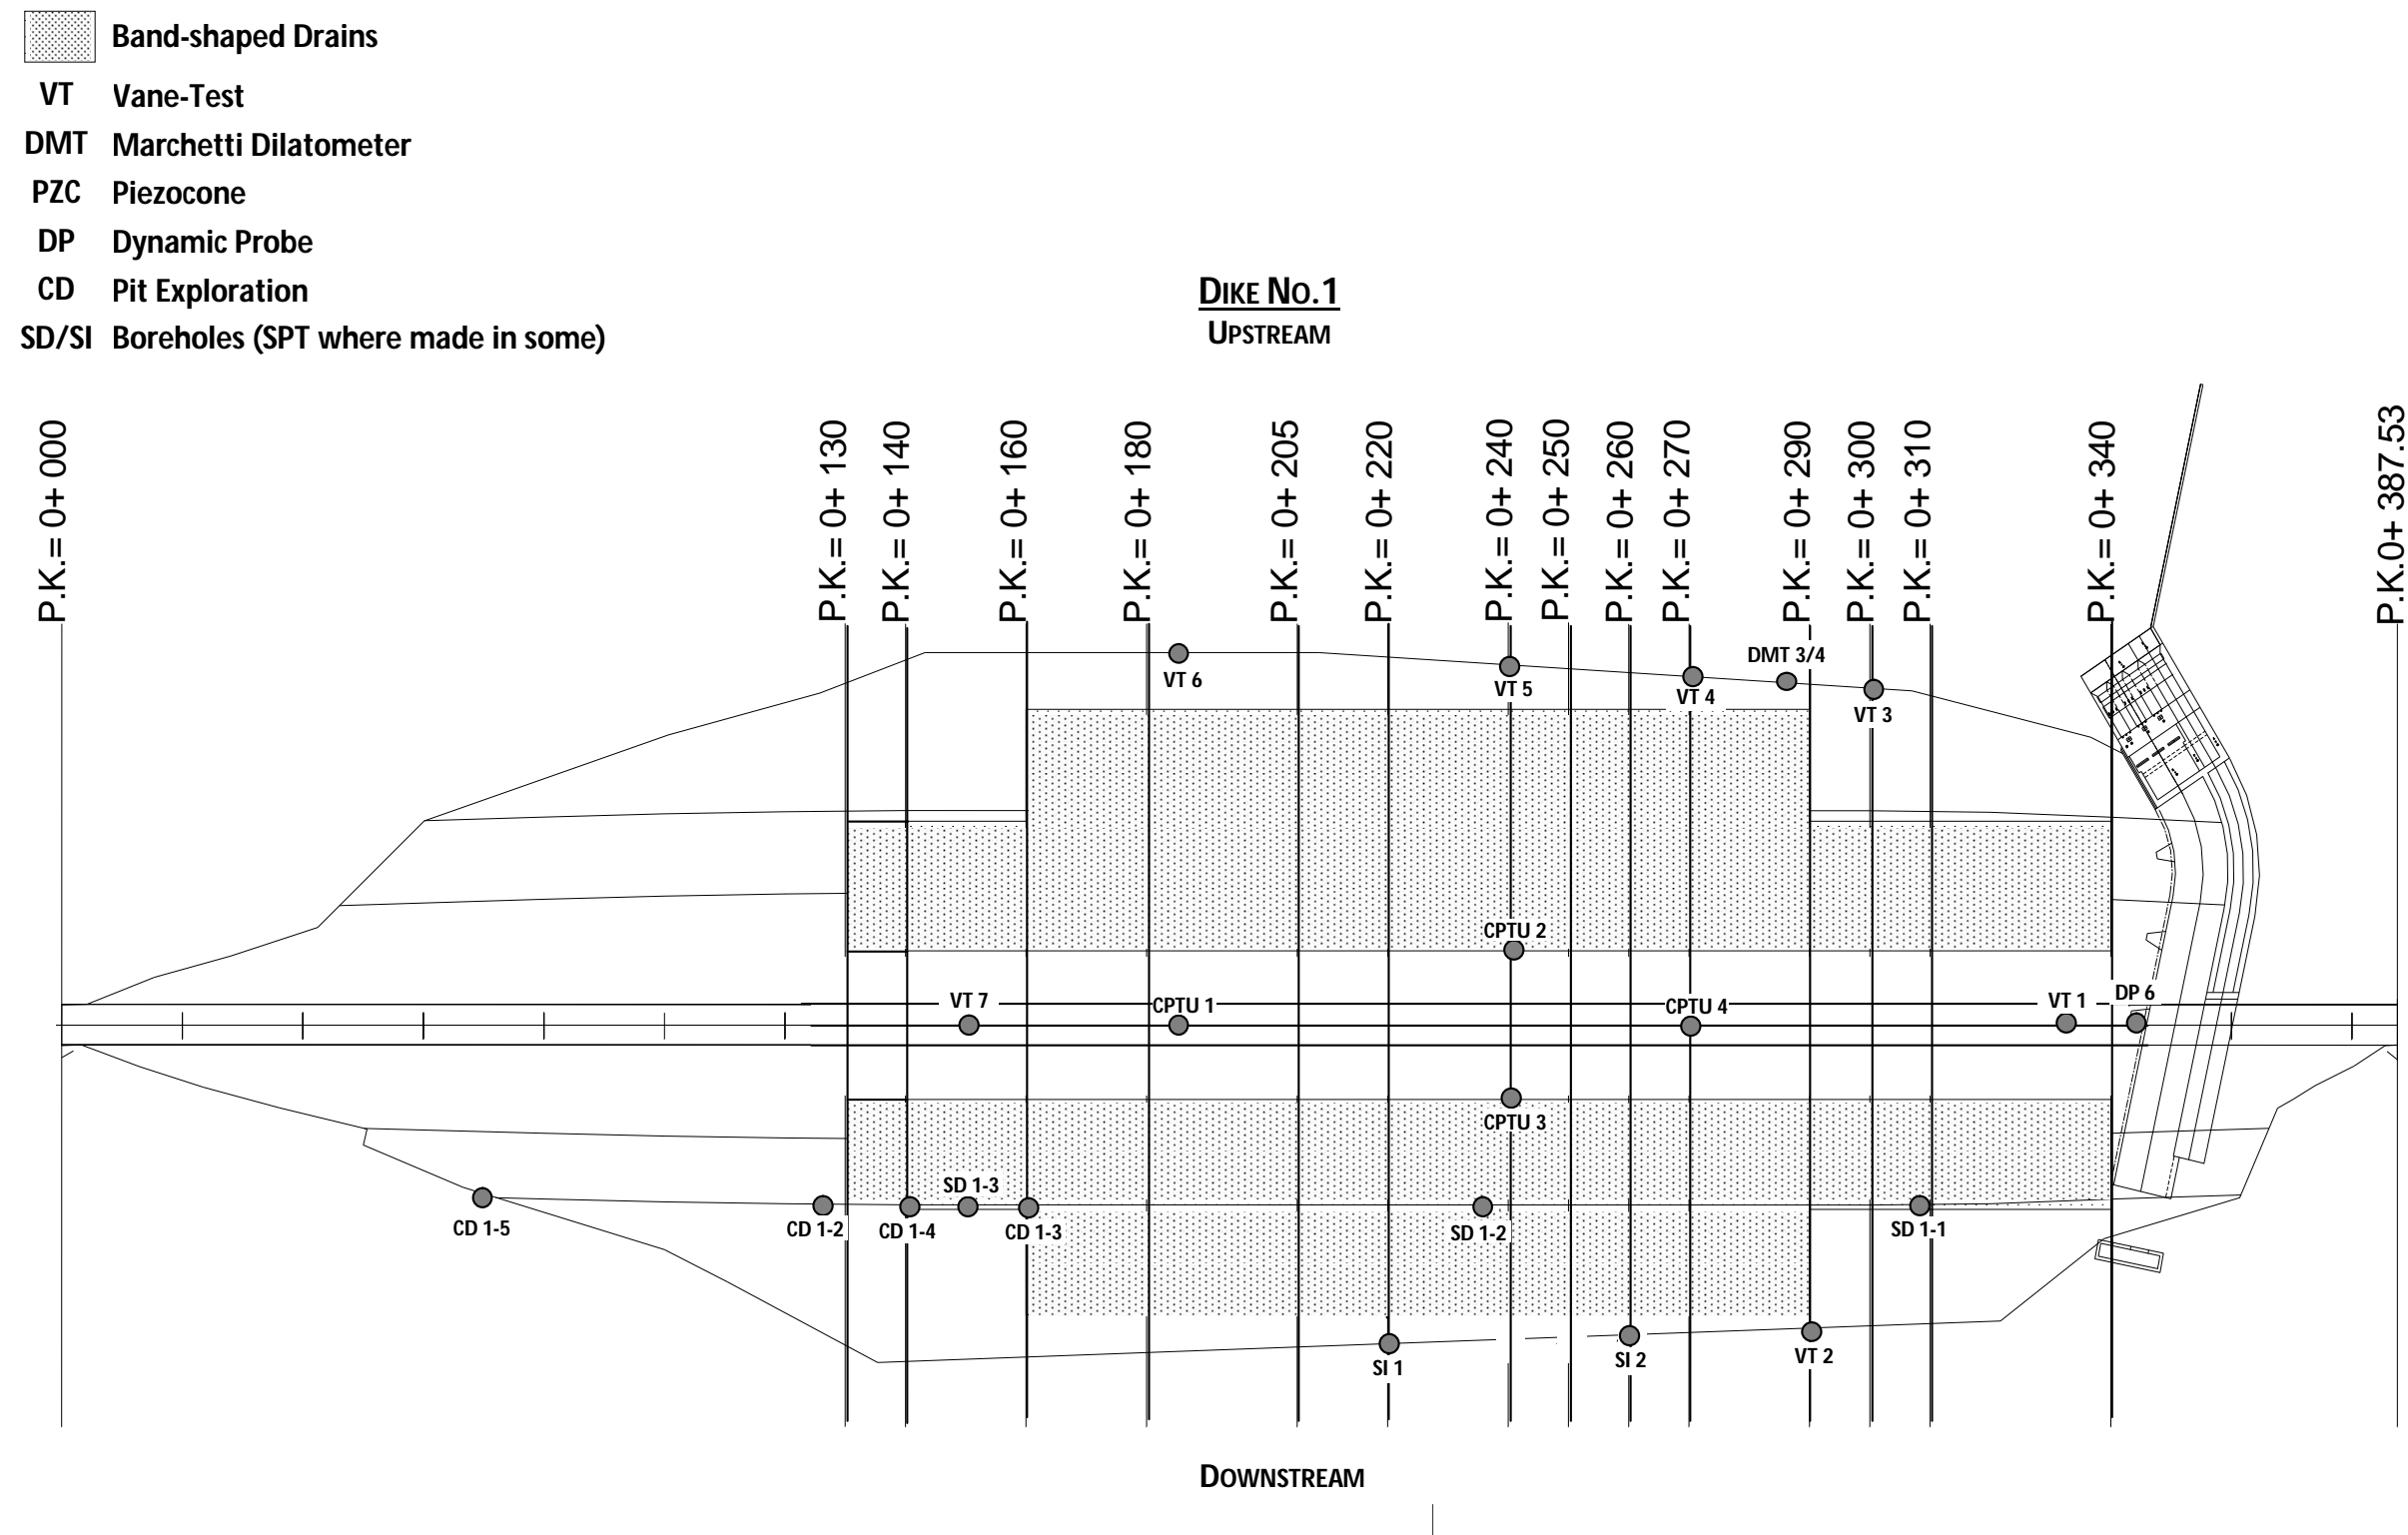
Plan showing the geotechnical site investigation made in Dike No.1.
